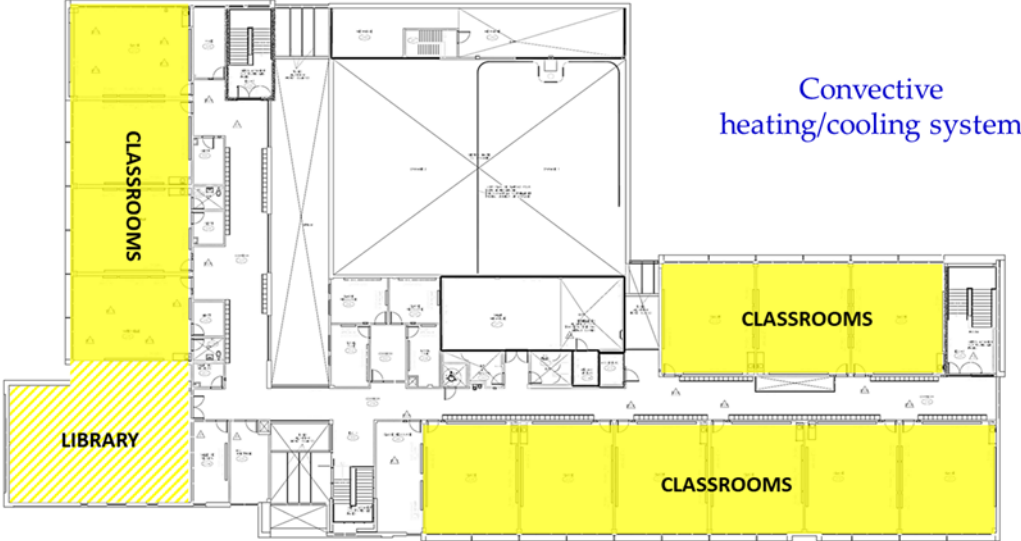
Plan view of the school and the HVAC system in each zone – Second floor
